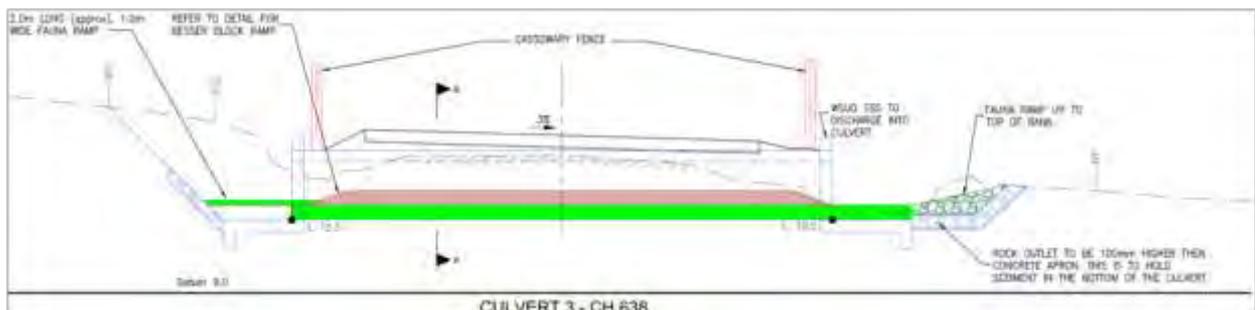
14 CH 0635 Fauna culvert long section showing location of ledges, ramps and rock protection
